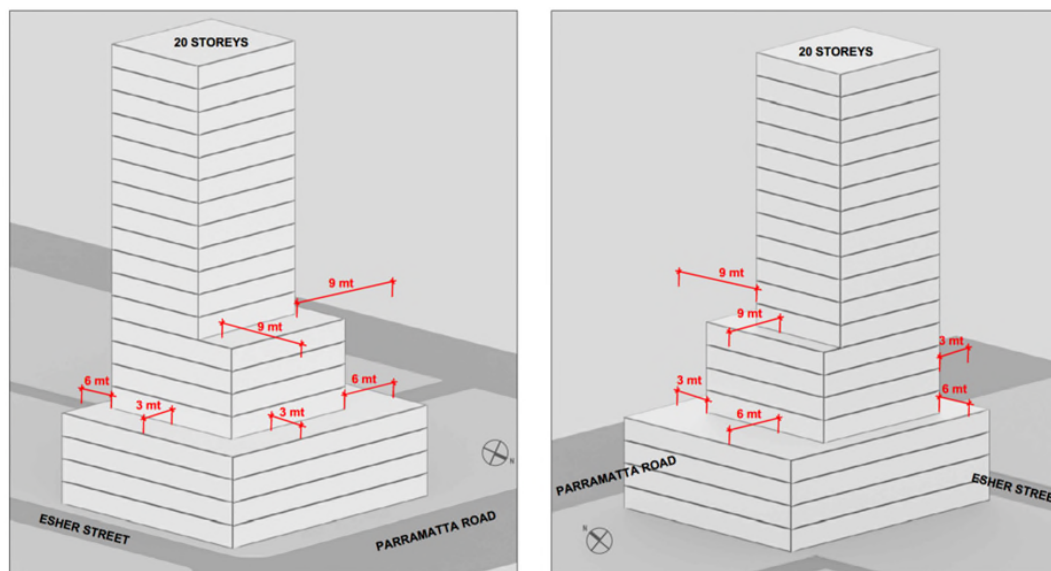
Extract from submission - Proposed envelope conceptual site massing for Nos.336-336A Parramatta Road (Source: Tony Owen).
